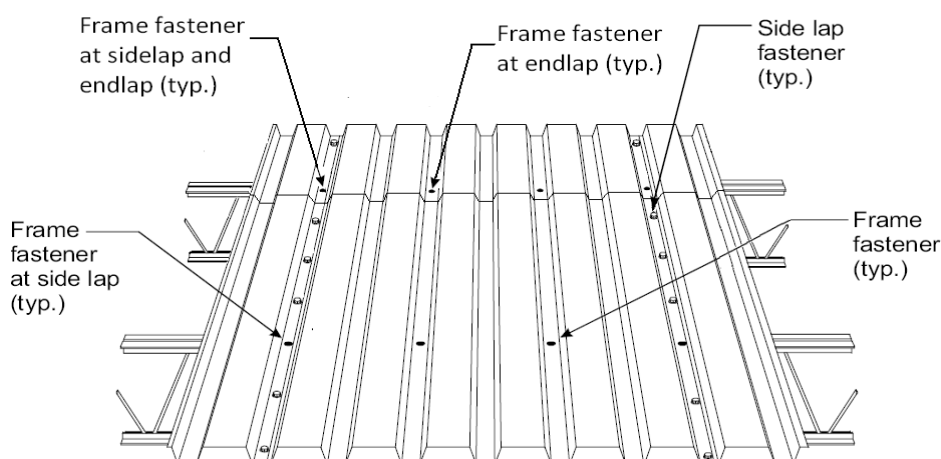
Typical fastener arrangement for roof deck diaphragms
